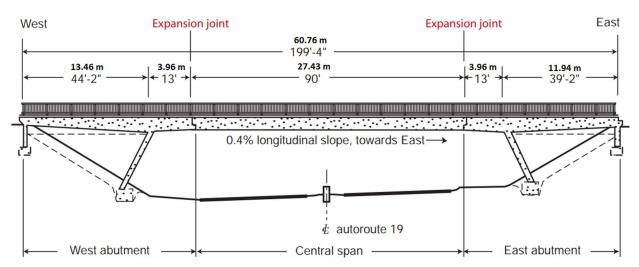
Elevation View of the de la Concorde Overpass from Autoroute (Highway) 19
